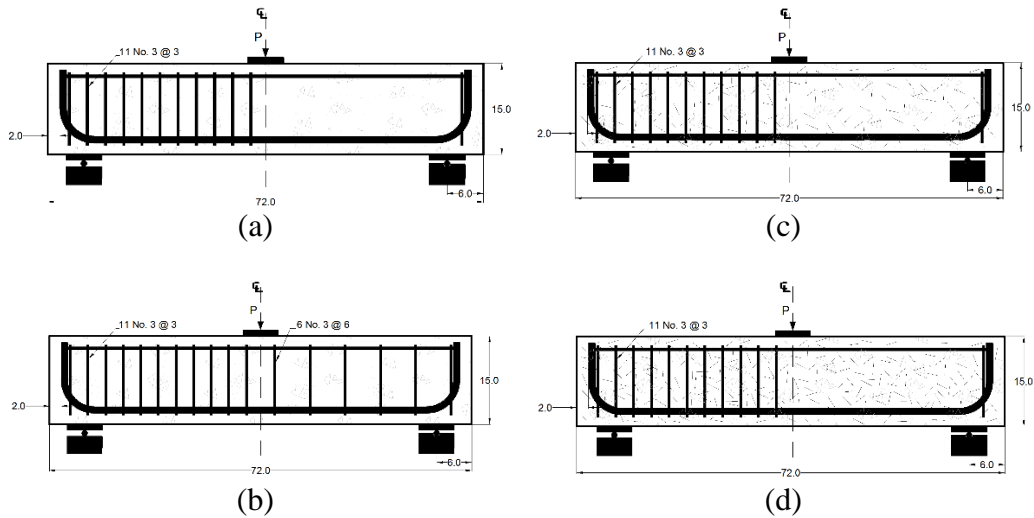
Details of large-scale specimen in inches; (a) Reinforced Concrete beam (RC), (b) Reinforced concrete beam with minimum stirrups (RCS), (c) Synthetic fiber-reinforced concrete beam with  $V_f=0.5\%$  (SNFRC 0.5%), and (d) Synthetic fiber-reinforced concrete beam with  $V_f=0.75\%$  (SNFRC 0.75%)
